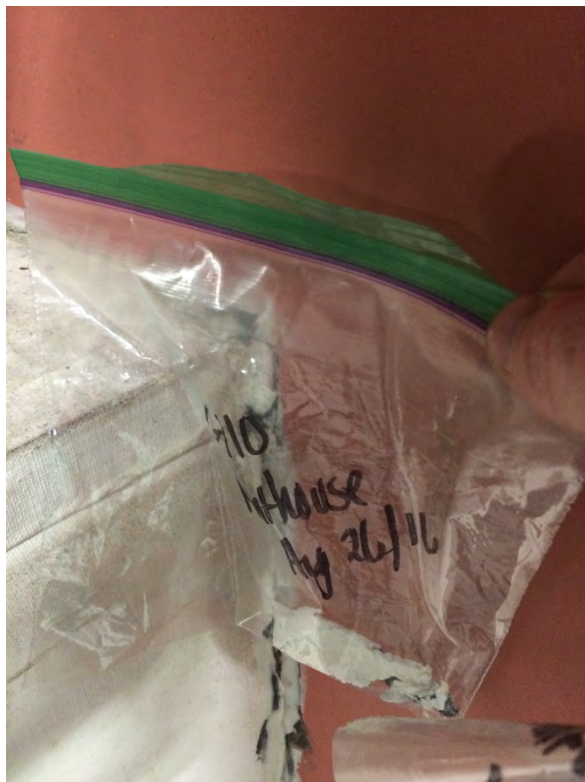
Asbestos sample A35, ductwork sealant (caulking), collected where ductwork passes through wall in penthouse of Pod G10. The material contains 2% chrysotile asbestos.
